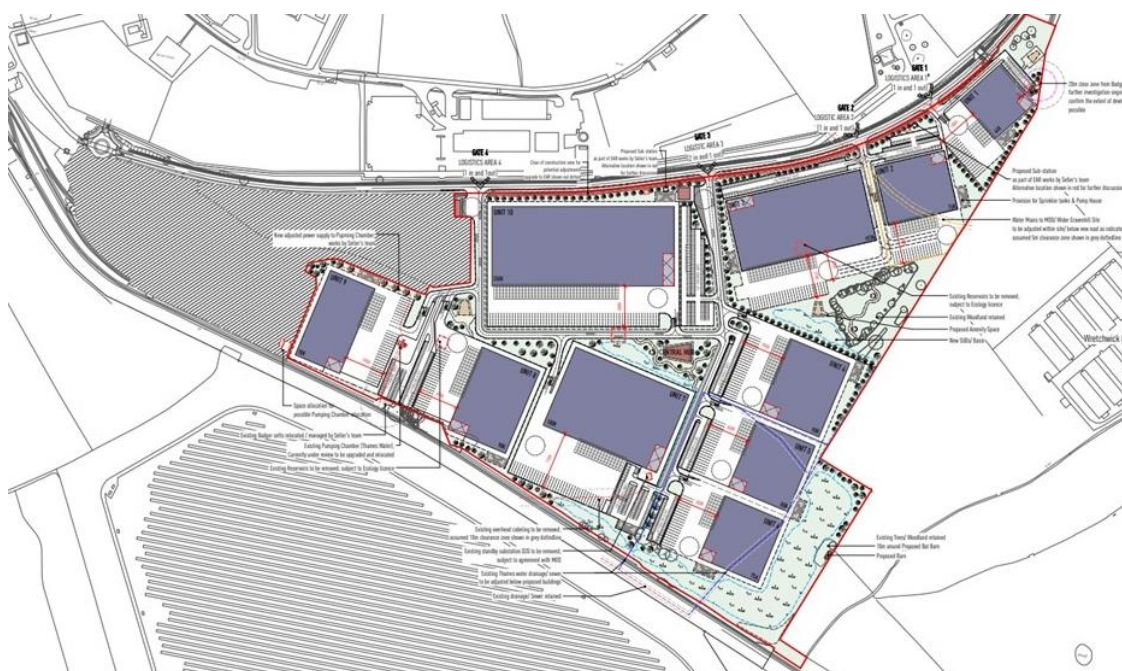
Indicative Masterplan Layout (March 2022 version)
